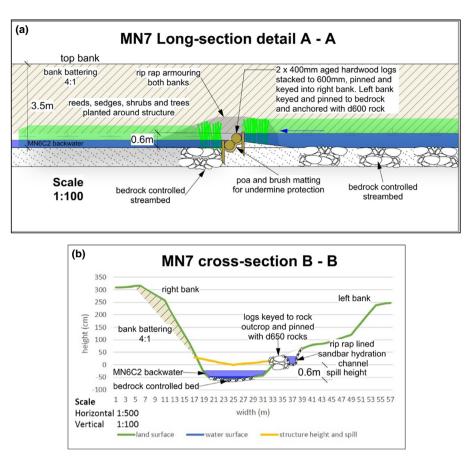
Detail of typical 'leaky weir' installation and revegetation. (a) Site MN7 long section AA, (b) Site MN7 cross-section B-B.
